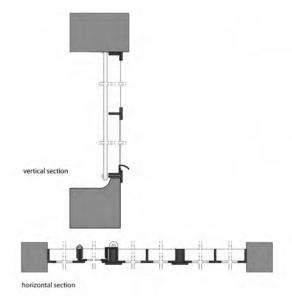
Atelier Ozenfant (1922). Plan and vertical section of the horizontal window on the 1st floor. The frames are formed of assembled standard angles and T-shapes. Thicker steel mullions support the casement bolt and strengthen the frame. Flat sheets screwed on this mullion reconstitute a rabbet. Drawing VF according to the working drawing FLC07830
